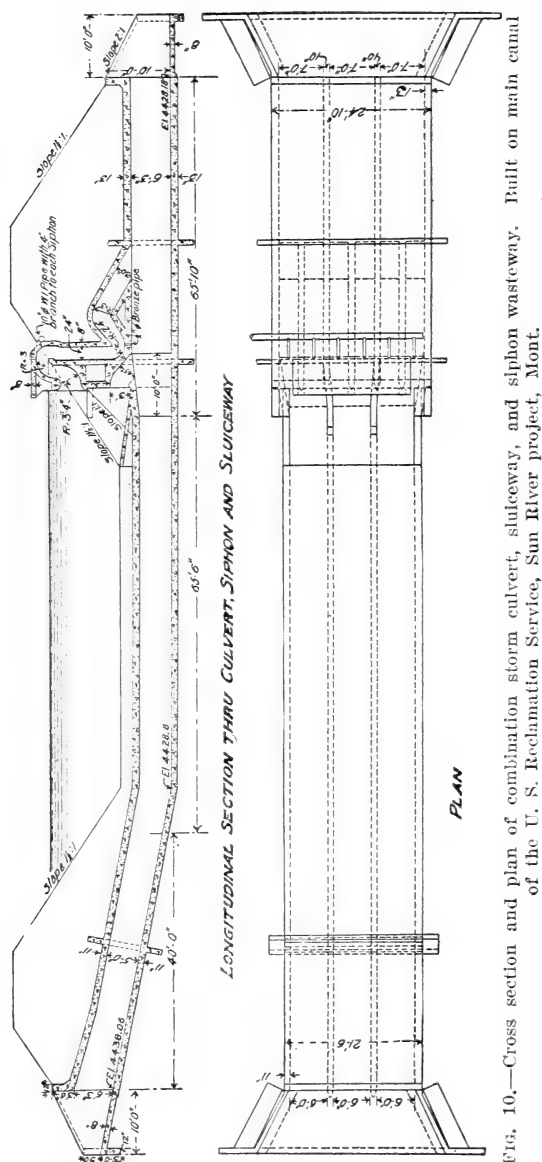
Cross section and plan of combination storm culvert, sluiceway, and siphon wasteway. Built on main canal of the U. S. Reclamation Service, Sun River project, Mont.
